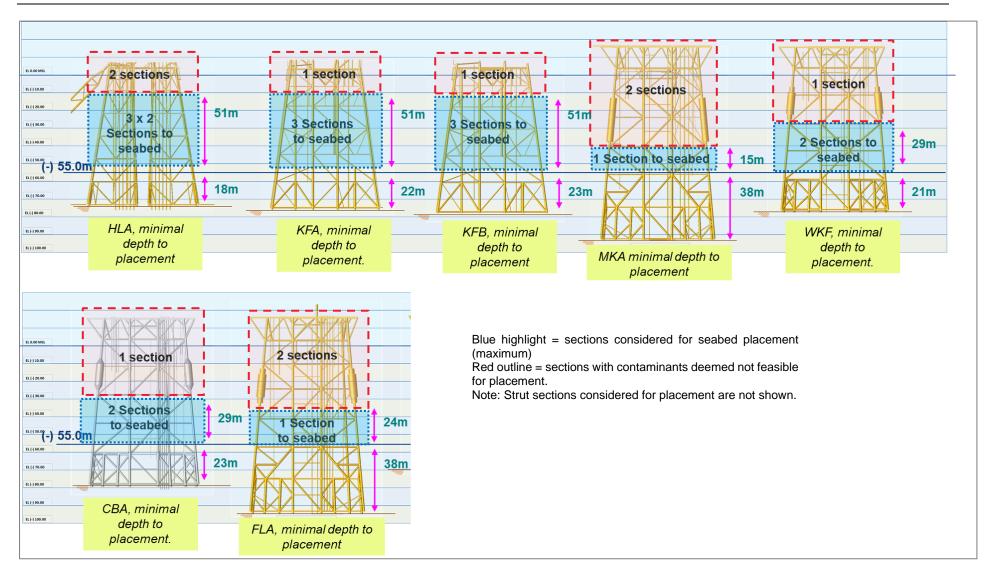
Steel Piled Jacket removed sections considered for seabed placement
